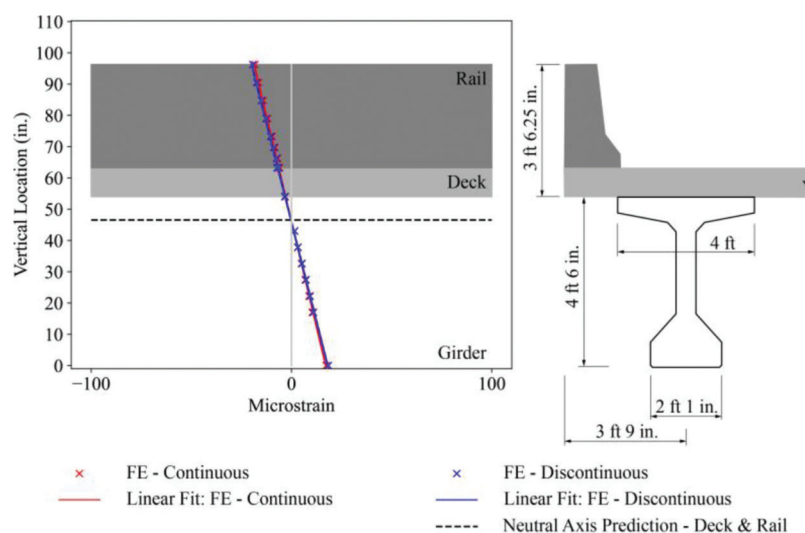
Effect of rail discontinuity for three-span continuous prestressed concrete girder bridge with FC rail: FE predictions for strains at peak positive moment location.
